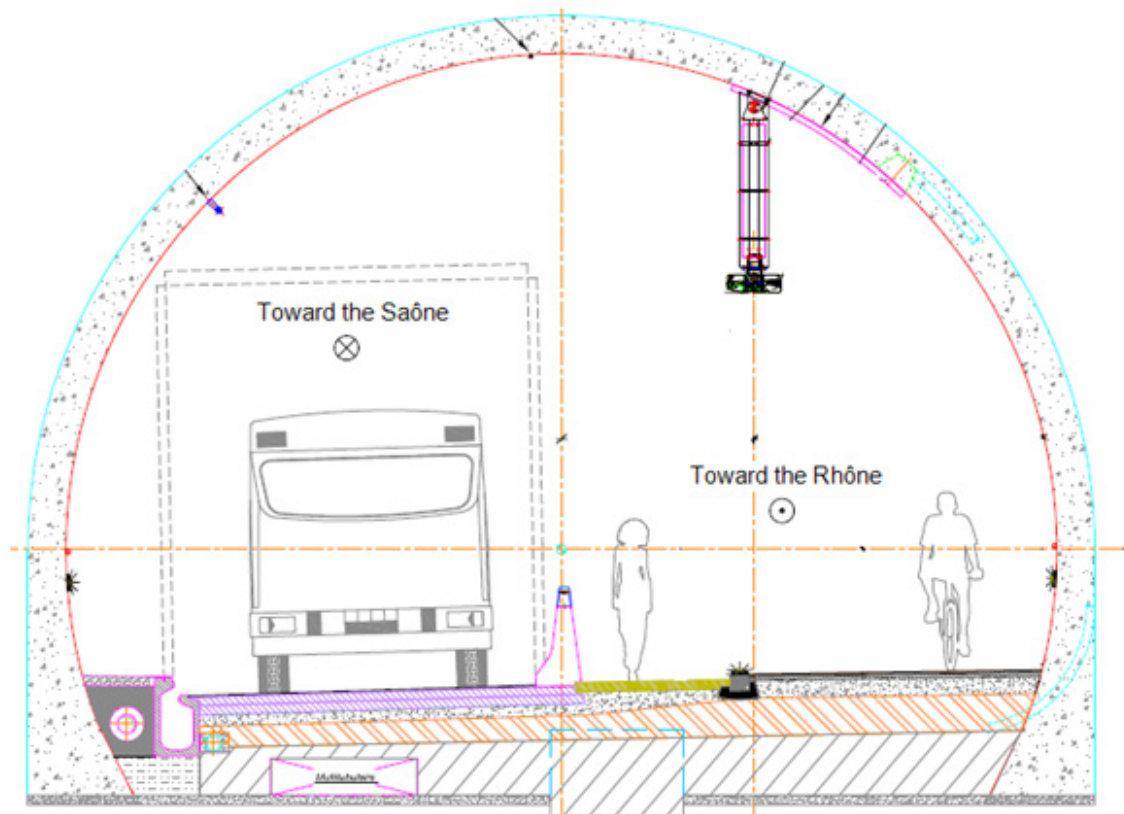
Cross-section of the Croix-Rousse tunnel safety gallery
